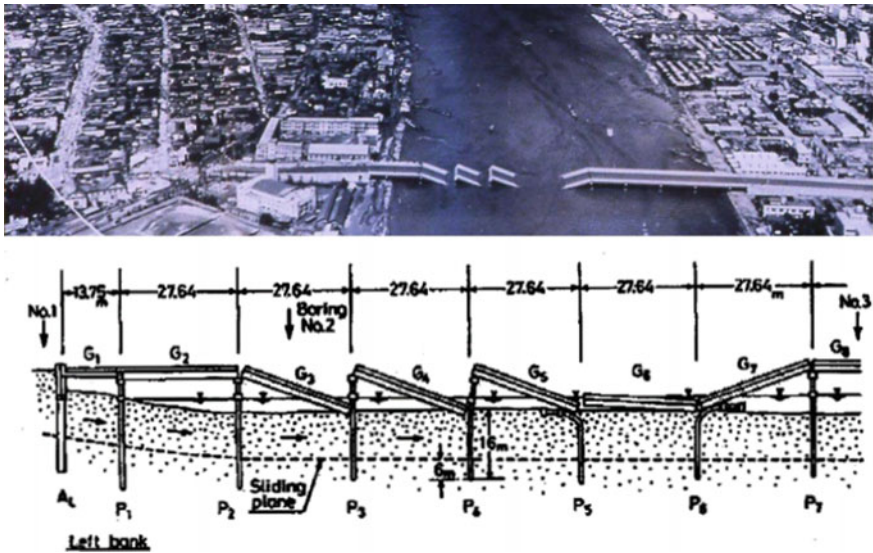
Schematic diagram of the fall of the girder in Showa Bridge, Bhattacharya et al. (2005)
